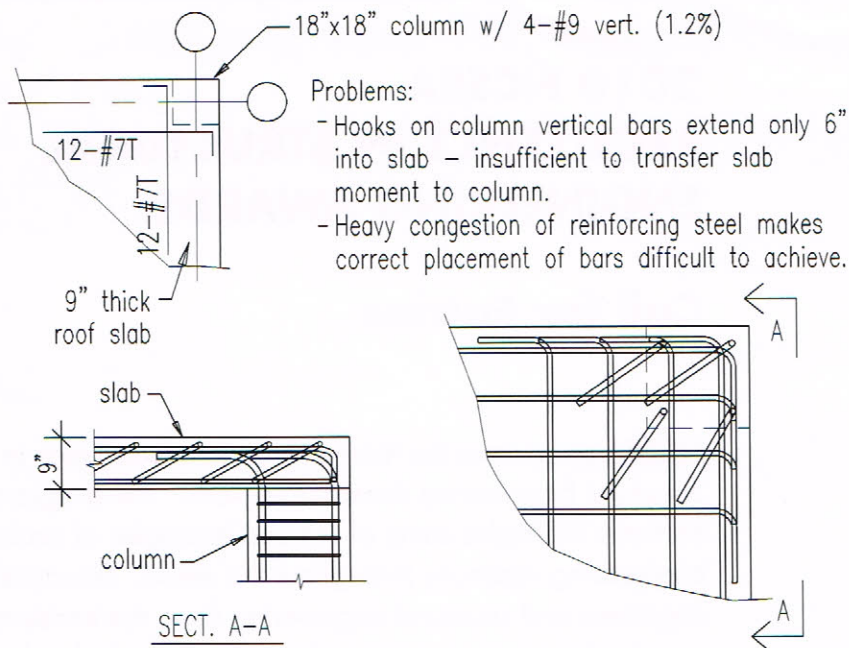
Engineers must consider whether reinforcing steel can be installed and properly developed.
